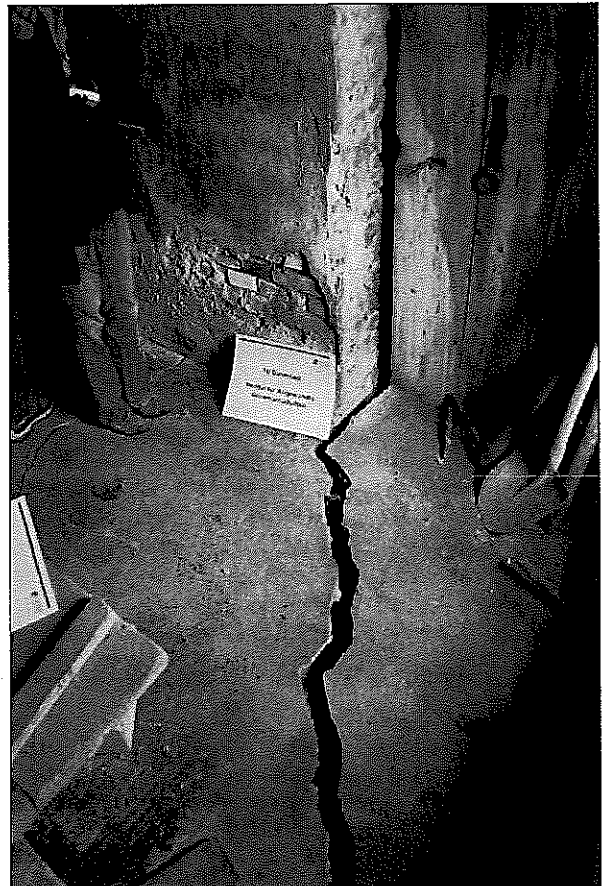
Tension crack in a baseplate, building Jünergasse, distance to the well field approx. 70 m to the northeast, March 2009 (Photo: U. Burbaum).
